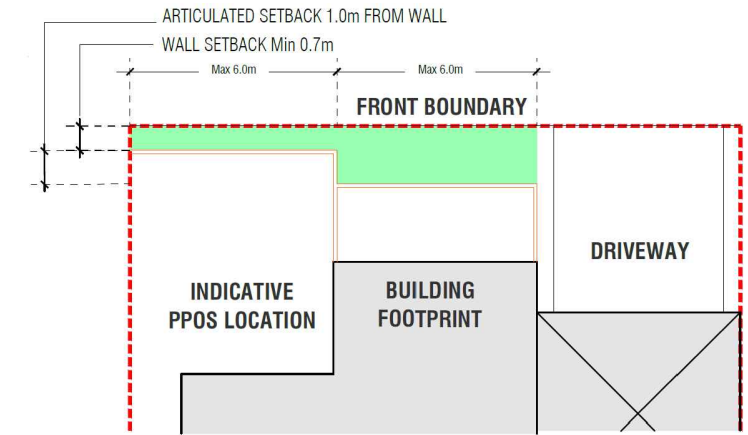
EXAMPLE - COURTYARD WALL, SHOWING ARTICULATED PLANTING ZONE SETBACK
